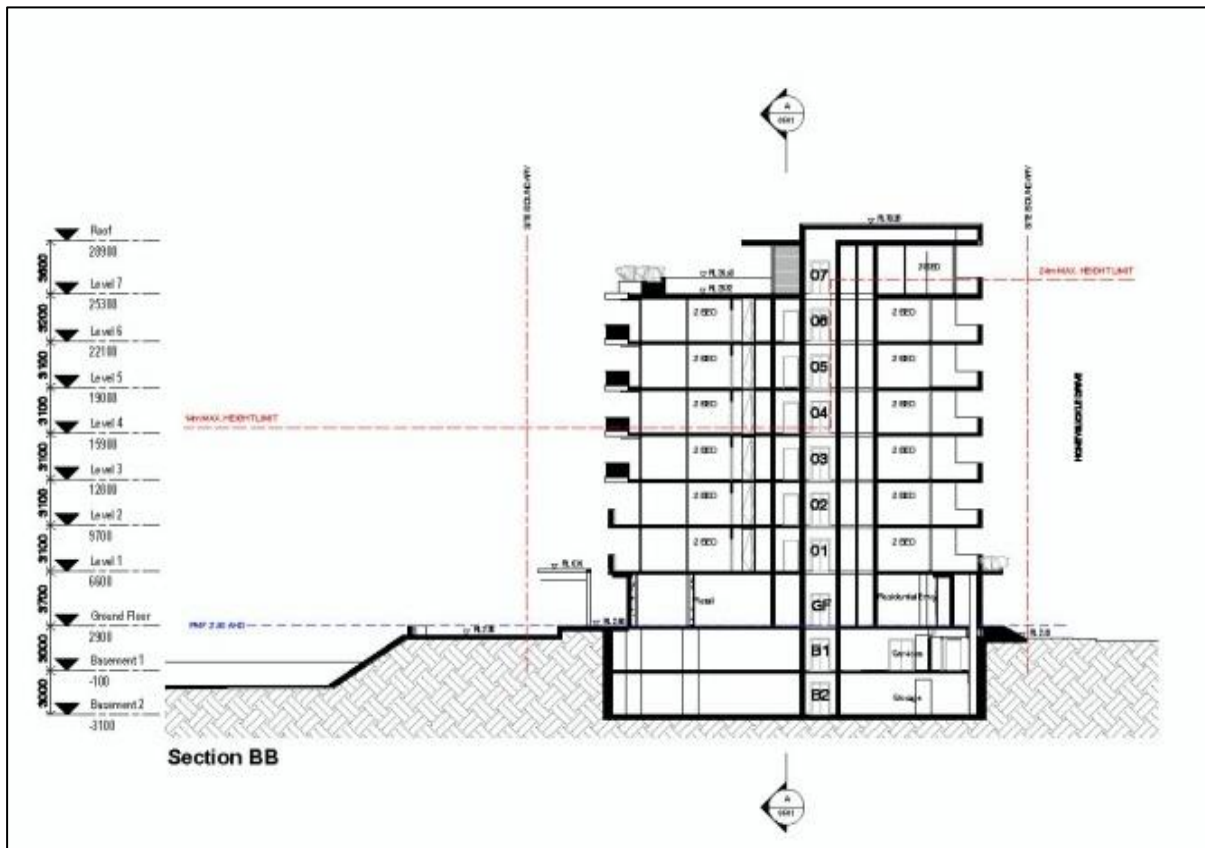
Section of proposed development (SJB Architects, DA-A-0601, Rev 3)
